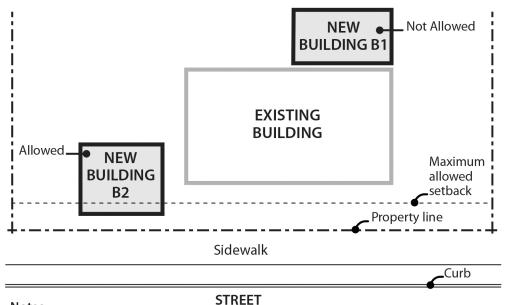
New Buildings On Sites With Buildings That Do Not Meet The Maximum Building Setback
